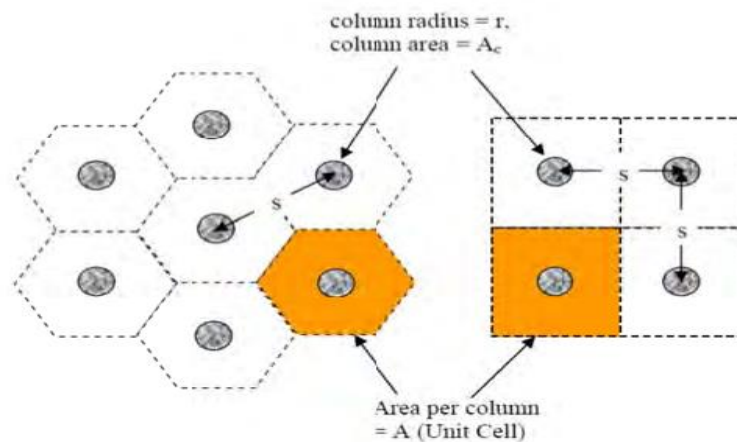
Plan of stone column, triangular and square pattern (Taube et al, 2002)
